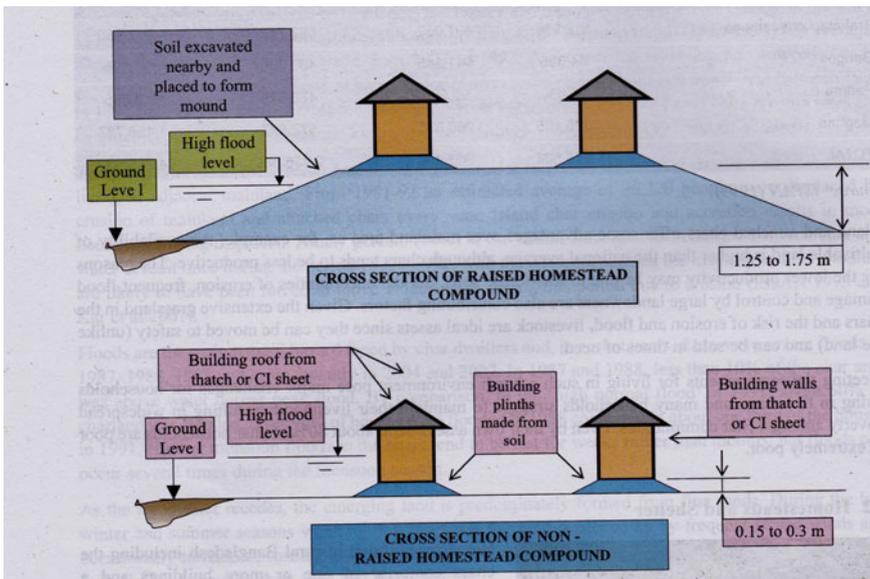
Layout of raised homestead. Source Care Bangladesh 2008
